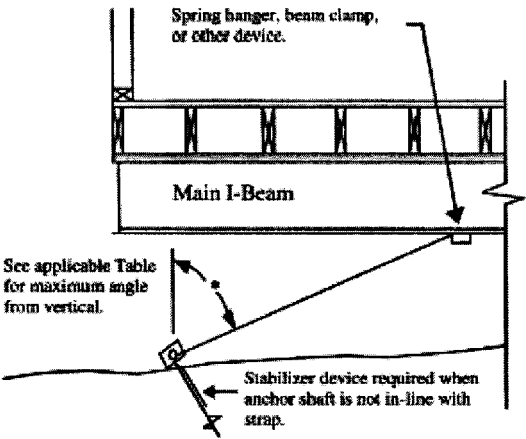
Connection to existing spring hangers, factory installed or site installed beam clamps.
